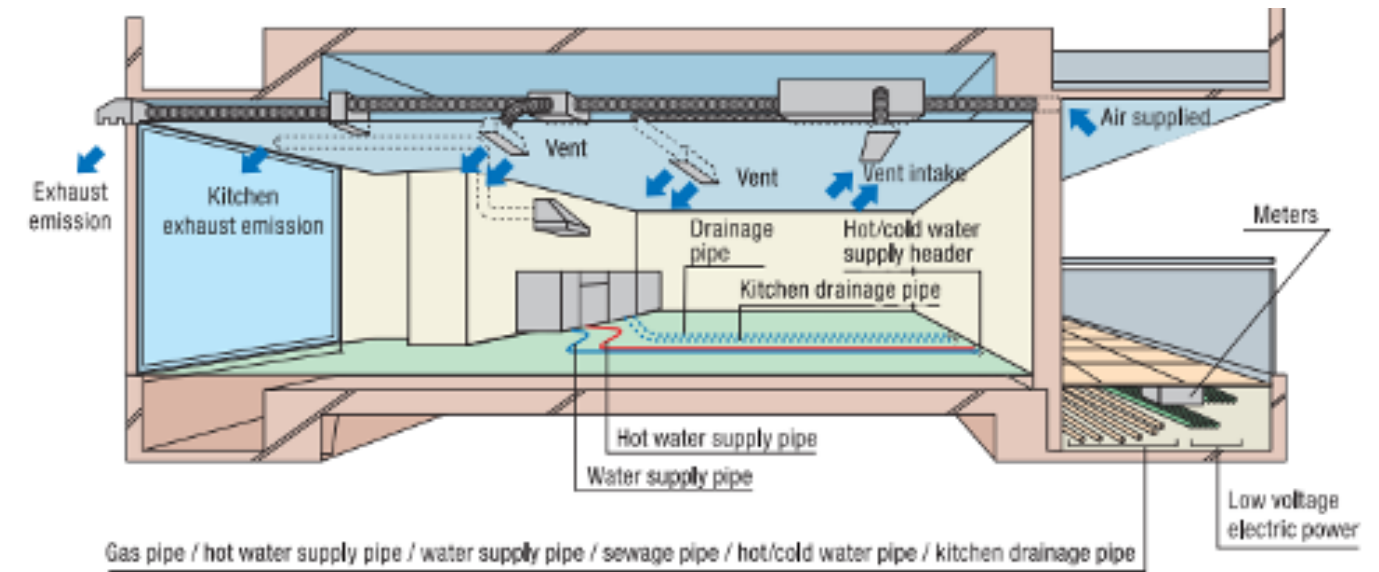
Raised floors and lowered ceilings provide space for Service Infrastructure. (Source: Osaka Gas Co, 2015)
